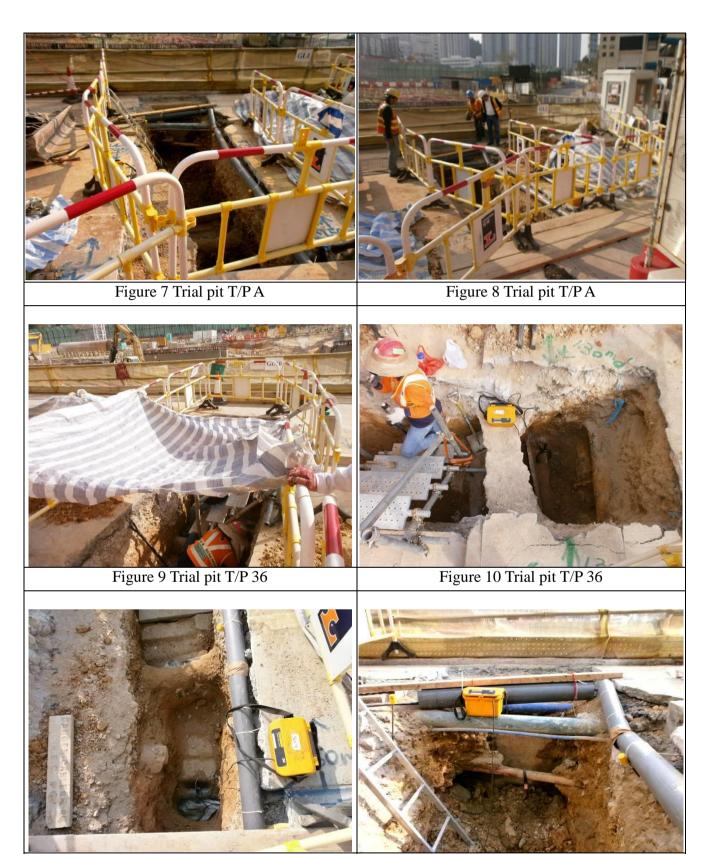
Locator setup at 275kv electric cable Figure 12 Locator setup at 11kv electric cable
